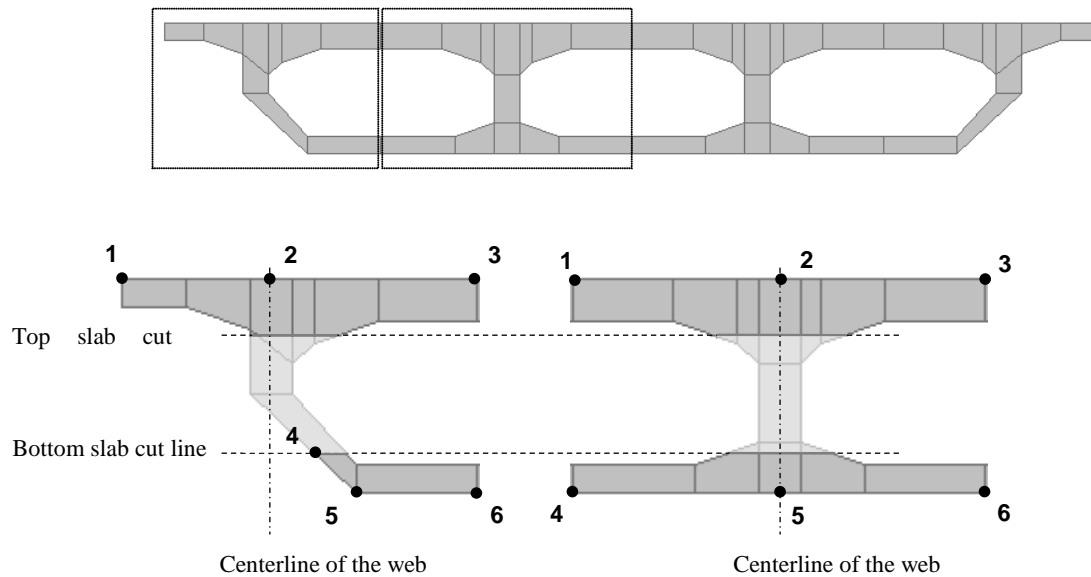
Bridge Concrete Box Deck Section - External Girders Clipped
